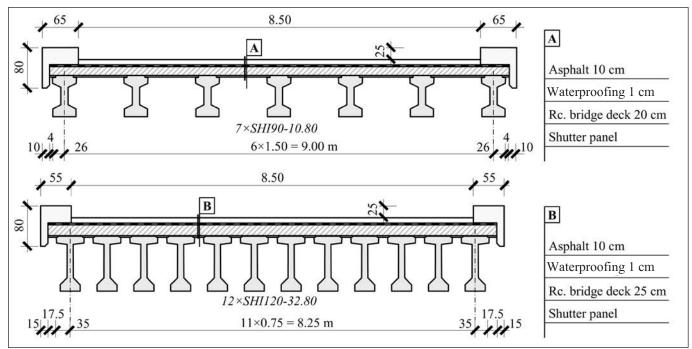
Sample cross-sections of bridge superstructures consisting of SHI90 and SHI120 beams
